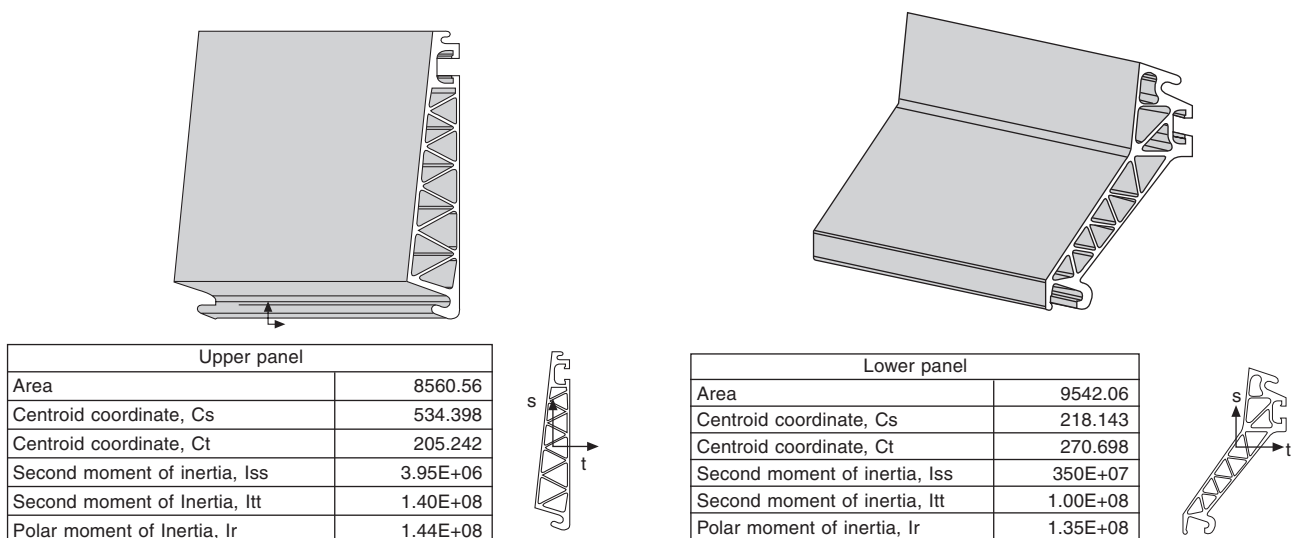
Three-dimensional model, cross-section view and inertial properties of the upper truss-core panel of the aluminum bridge parapet.
